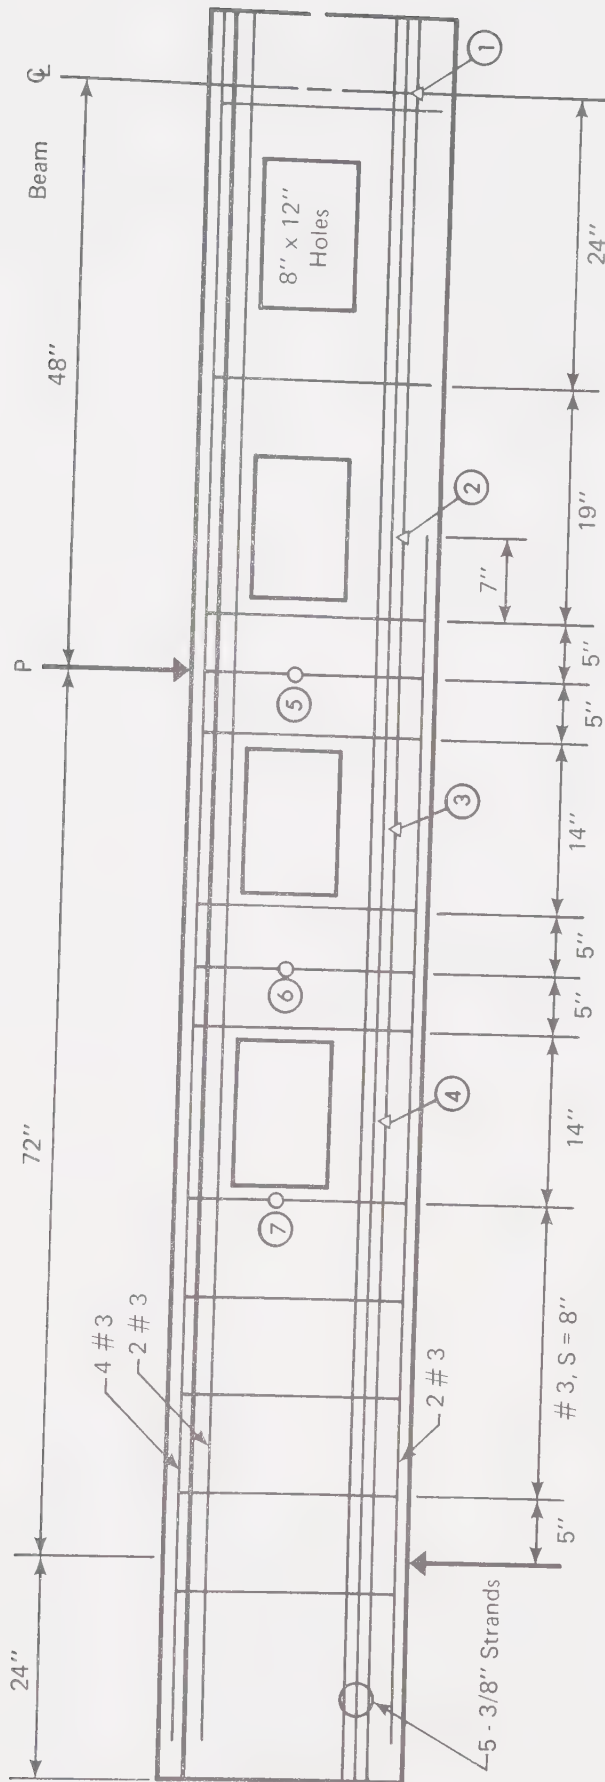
Reinforcement Details and Strain Gage Locations for Beam 15-12-6
